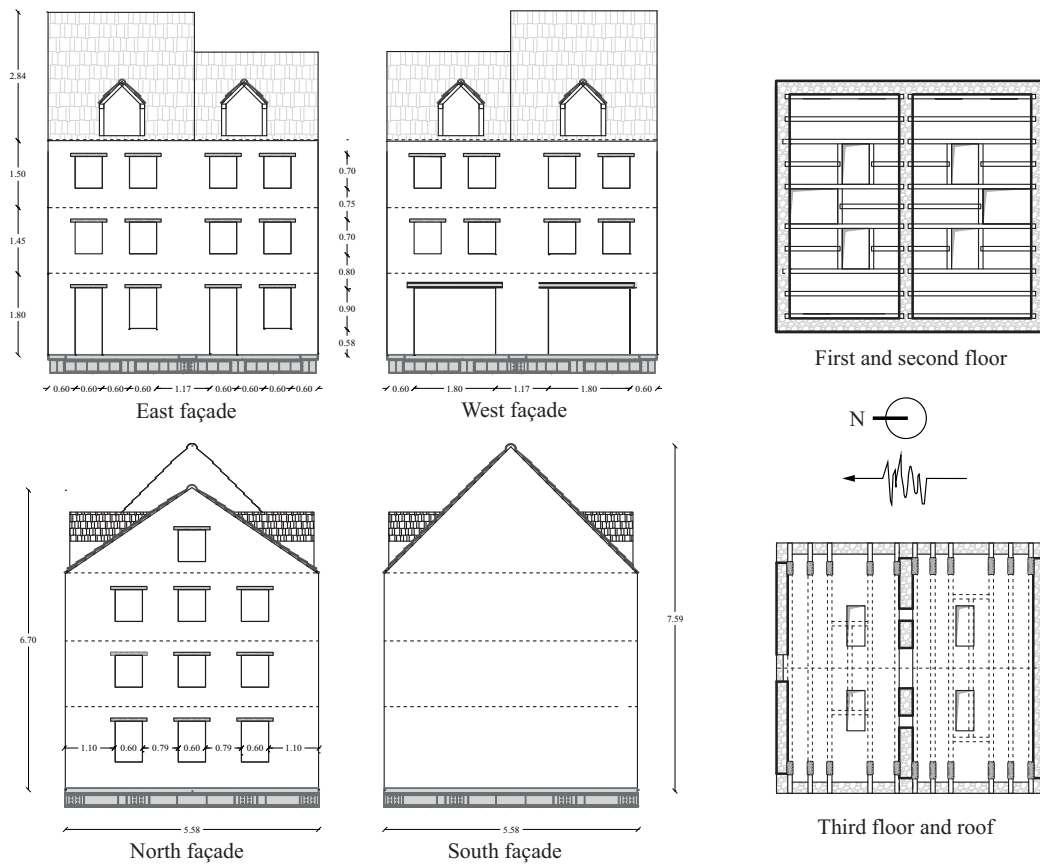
Front views and floor layout of the stone masonry building tested on the shaking table.
